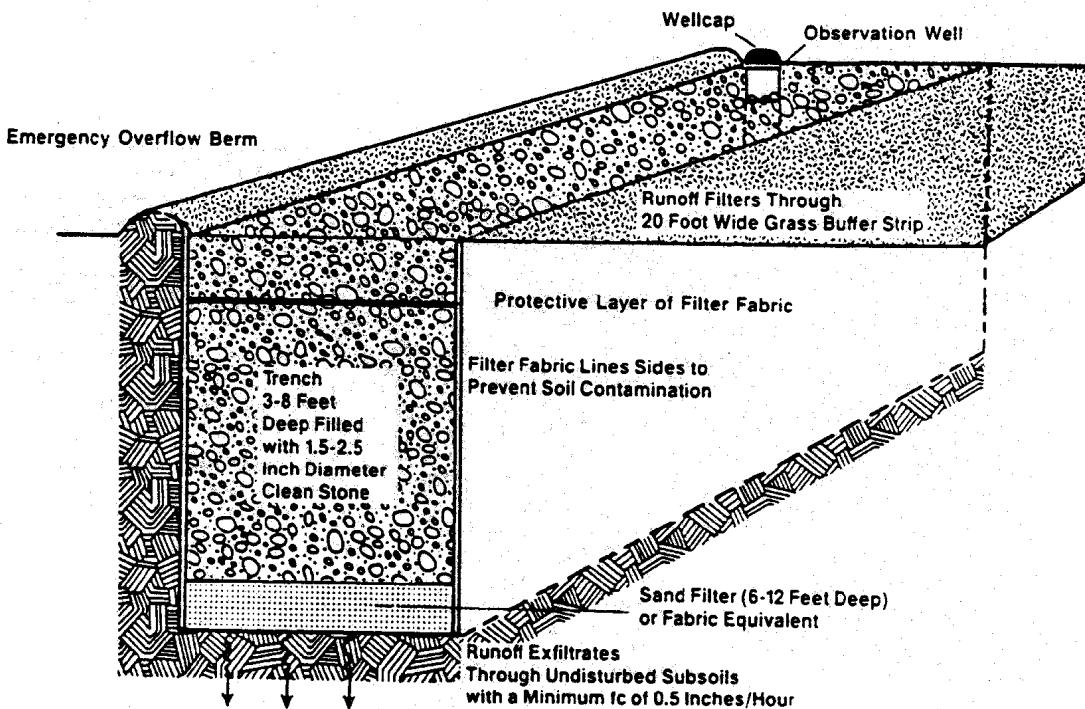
Basic design for a basin infiltration trench. (Source: 1993 ed., NYSDEC, "Reducing the Impacts of Stormwater Runoff From New Development")
